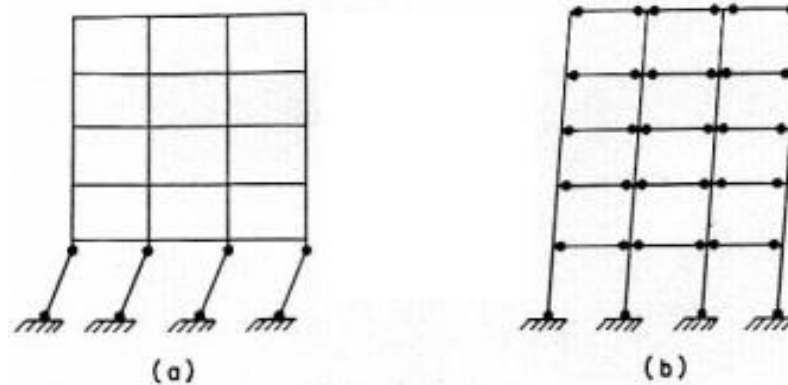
Potential choices for plastic hinges: (a) hinges in columns can lead to a soft storey mechanism; (b) hinges in beams can lead to desirable weak beam–strong column design.
